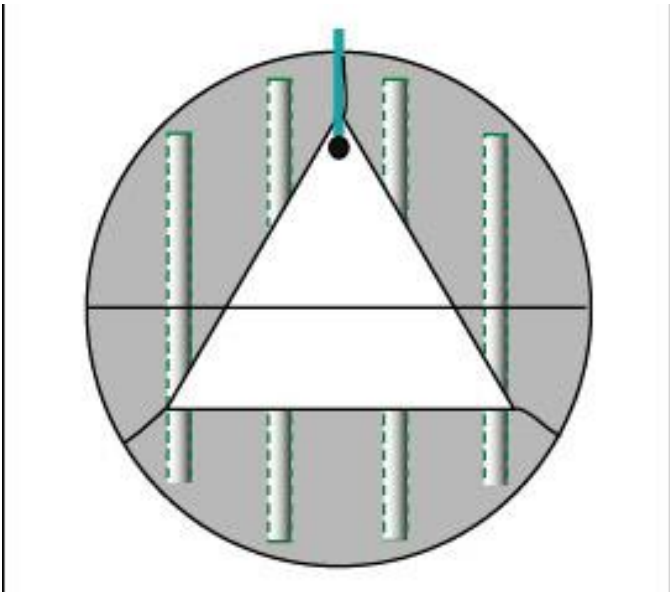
Typical placement and orientation of support timbers, drain, benches and floor seam (benches shaded grey)
